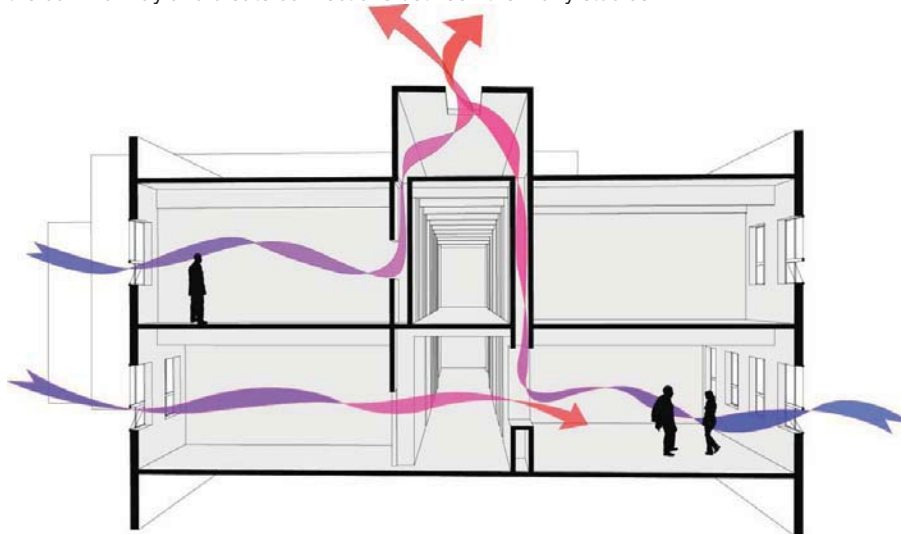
Renovated half walls to facilitate cross ventilation. Stack ventilation occurs through existing ductwork.
